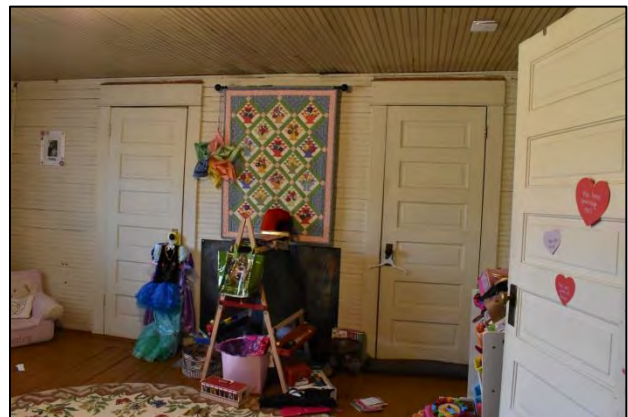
Original upstairs mantel, floors, walls, ceilings, doors, and surrounds in bedrooms
